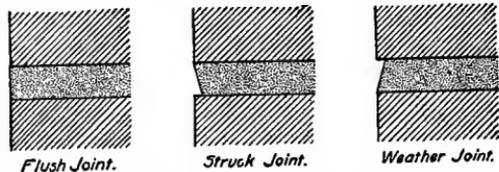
METHODS OF POINTING BED JOINTS OF COMMON BRICKWORK.
